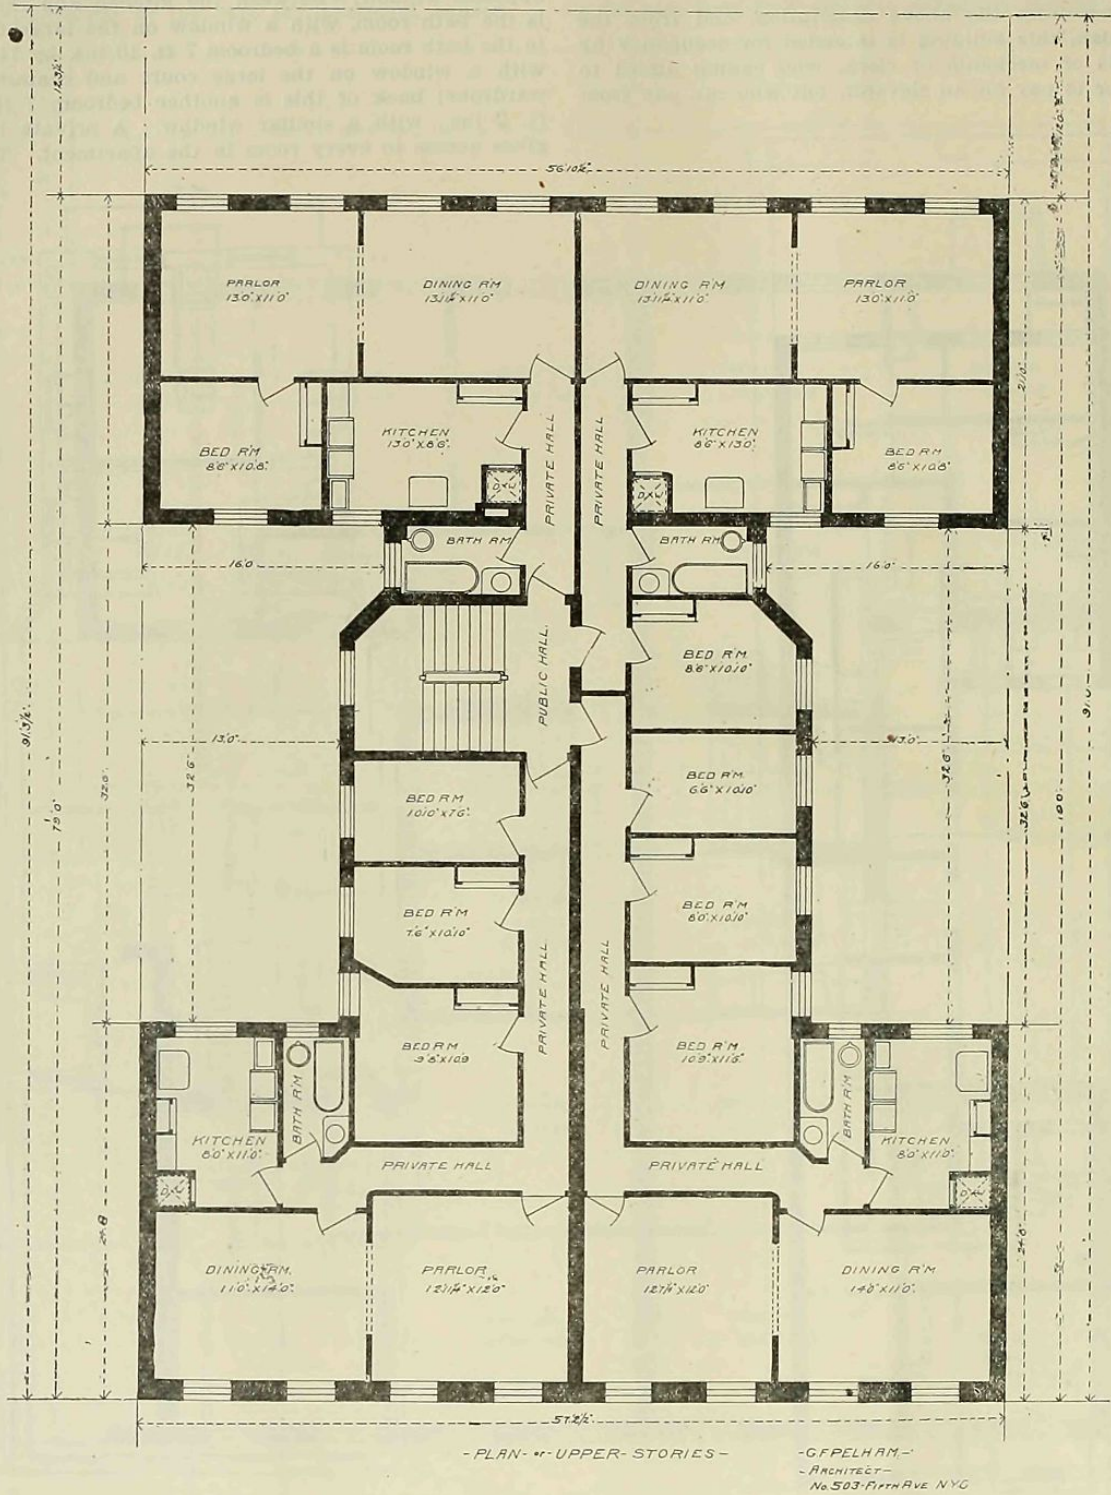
NO. 6-10 BARROW STREET, NEW LAW FLAT.
